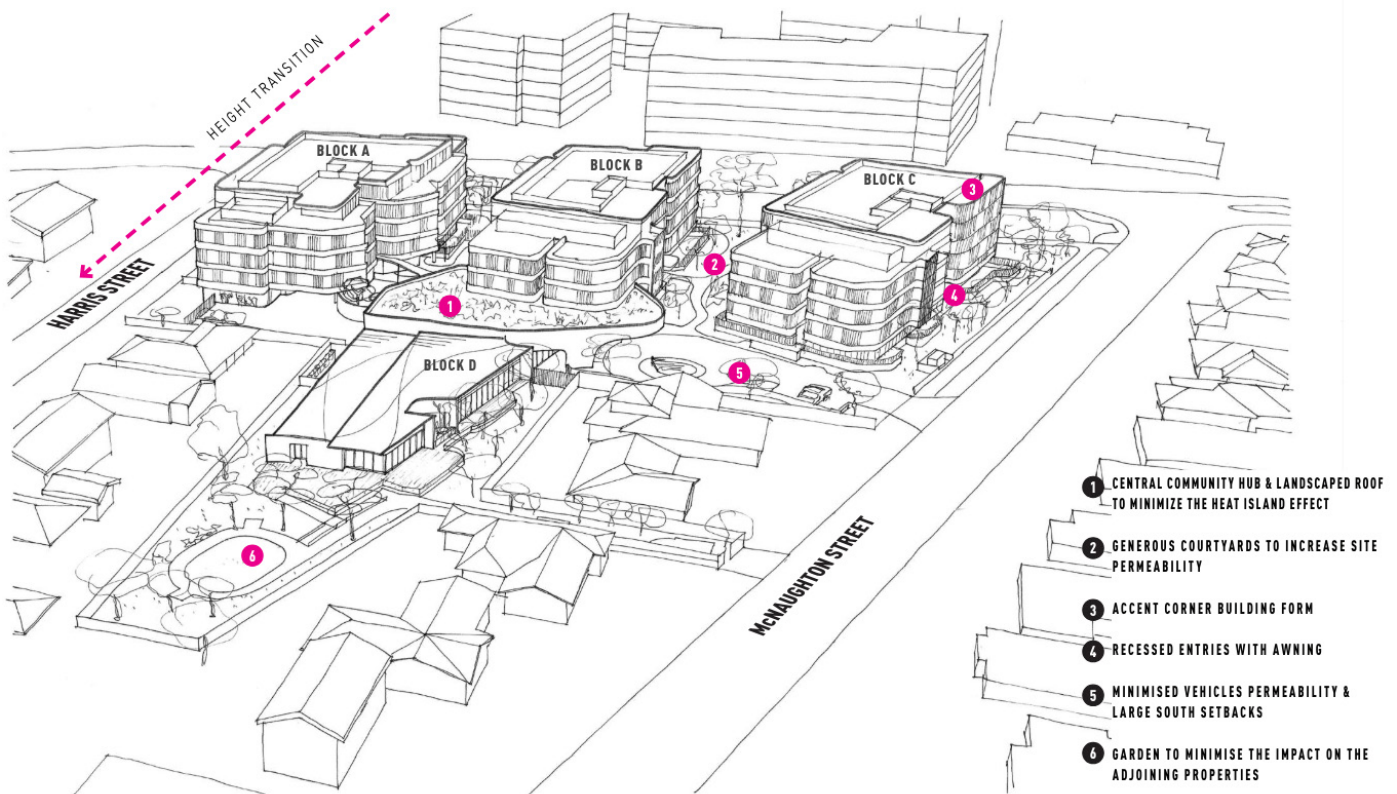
Aerial view of site looking north west from McNaughton Street (Source: Jackson Teece)
